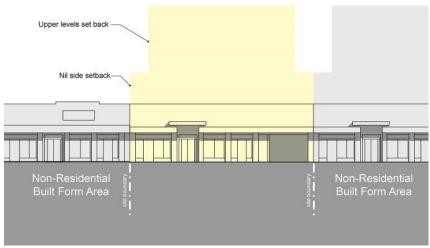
Side boundary setbacks adjoining non-residential area
